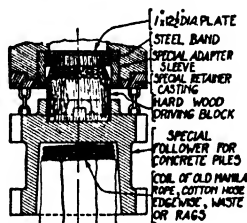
Cap Used on Industrial Brownhoist Steam-hammer for Driving Concrete Piles.
